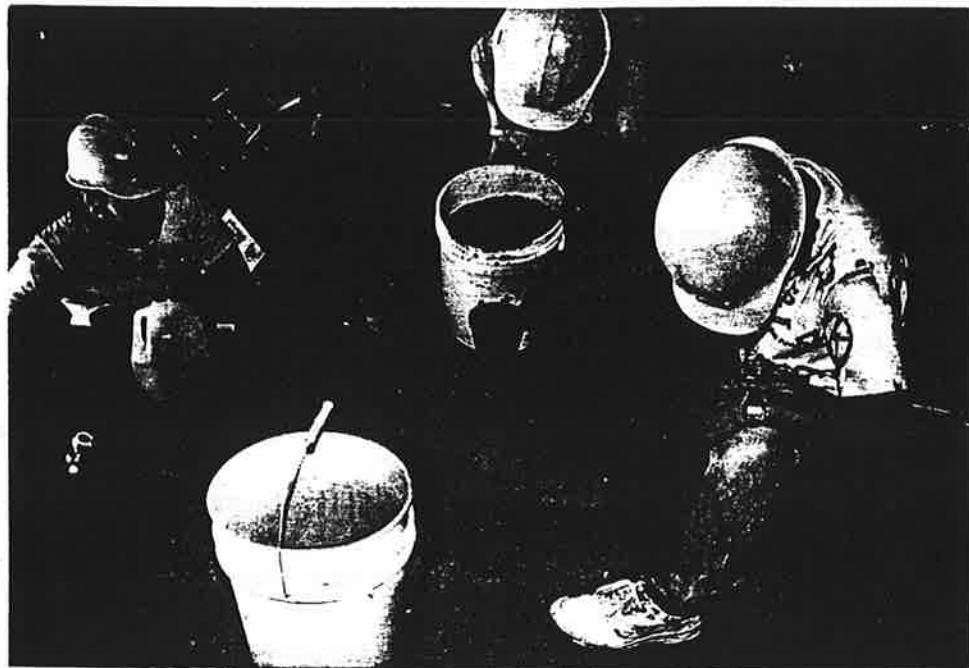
Grouting Haunch and Blockouts for Headless Studs
